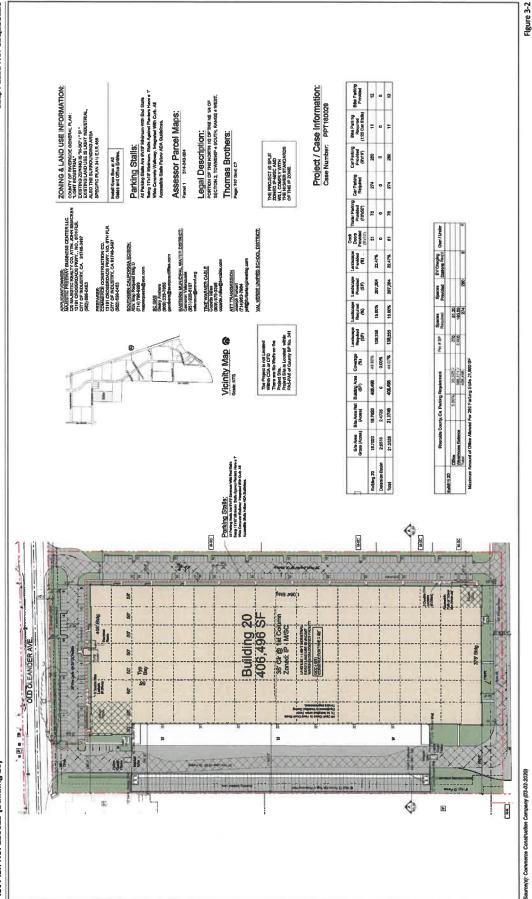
, *Plot Plan No. 180029 Master Site* Plan, depicts the overall site plan proposed as part of the Project, while Figure 3-2, *Plot Plan No. 180029 Building 20 Site Plan*, depicts the site plan for the Building 20 site. As shown, the Project proposes to develop the 40.0-acre site with one high-cube transload short-term warehouse building (herein, "Building 20") and a detention basin/bio-retention basin. Specifically, Building 20 would be constructed on an 18.2-acres site located west of Harvill Avenue, south of and abutting Old Oleander Avenue, and north of Redwood Drive. In addition, a detention basin is proposed on an approximately 2.5-acre site located west of Harvill Avenue, east of Seaton Avenue, and north of Markham Street, which would provide water quality treatment and detention for runoff from the Building 20 site. Additionally, a 19.3-acre parcel located between the Building 20 site and the detention basin site (herein, "Staging Area") is proposed to be used as a borrow site for grading operations, stockpiling of earthwork material, and as a staging area for construction equipment during the construction of Building 20. No buildings or other improvements are proposed on the Staging Area site, with exception of a proposed driveway providing access between Harvill Avenue and the Building 20 site and utility improvements (as described below).
